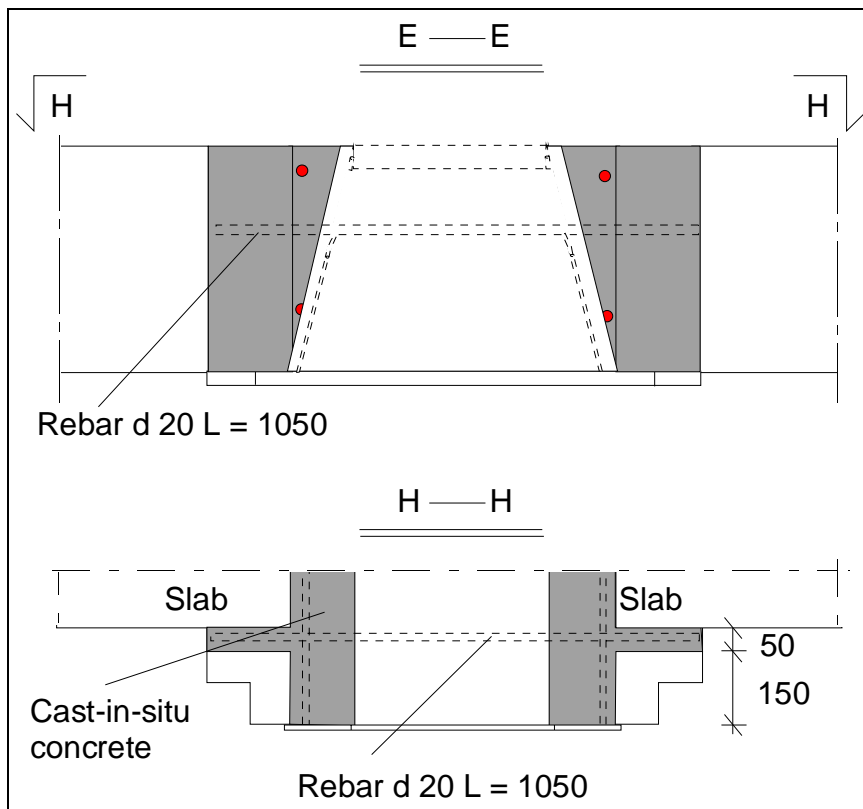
Tie reinforcement in the cast-in-situ concrete outside the longitudinal edge of the outermost slabs (section E-E in Fig. 2). See also App. A, Fig. 3. Rebars are made of steel A500HW.
